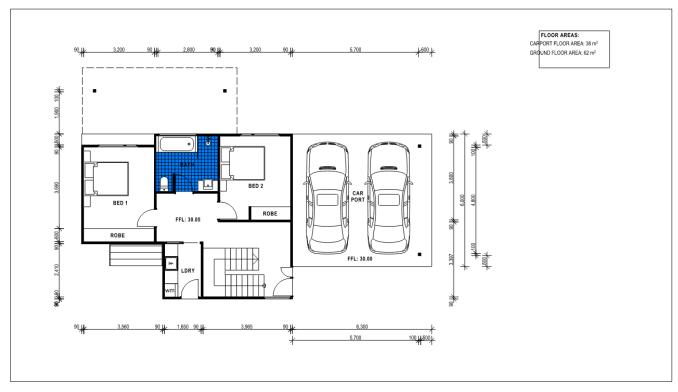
Ground floor plan (Cykel Architecture, 2023)
